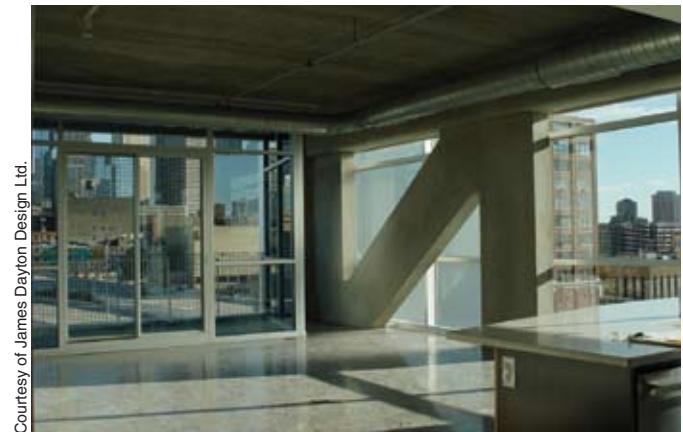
This interior photo of a typically spacious level in the Stack building shows the marvelous open views of the Minneapolis, Minn., skyline afforded by column-free construction.
